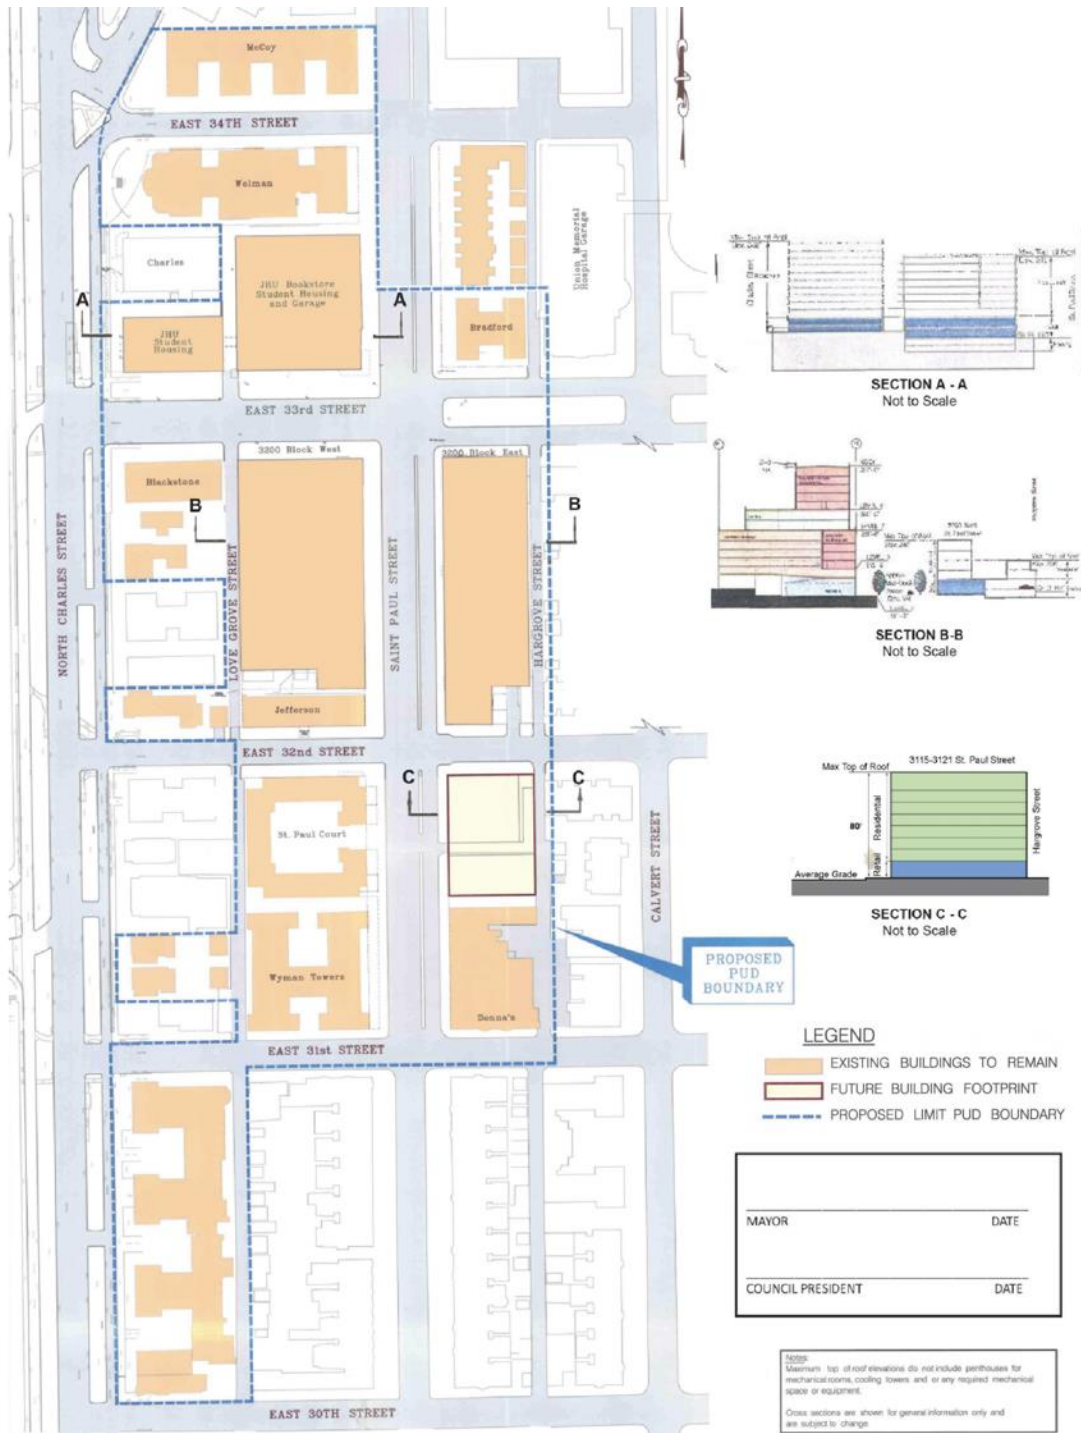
Clip of the North Charles Village PUD Sheet 3 of 4, “Preliminary Built-out Plan”, proposed revision, December 2023. Note the section C – C has been added, the height changed from 90’ to 80’ and the PUD boundary remains the same as in the currently approved Sheet 3 of 4, “Preliminary Built-out Plan” dated October 2007.
